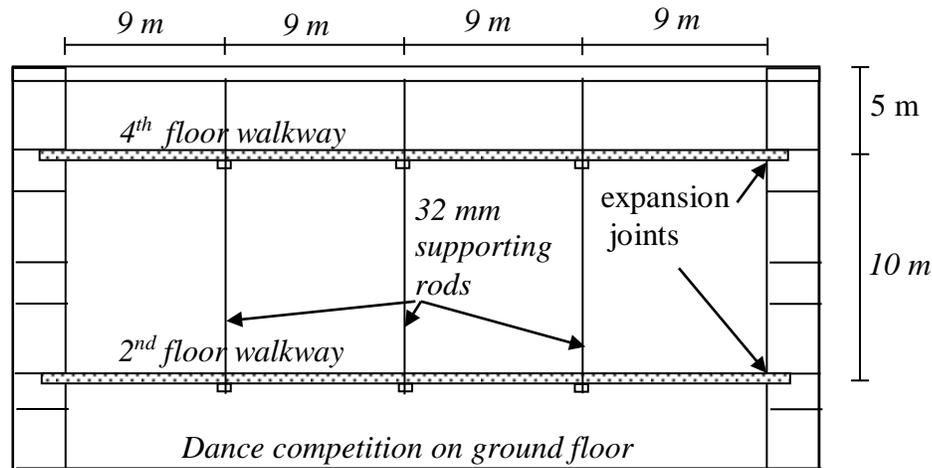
Kansas City Hyatt Hotel: arrangement of walkways
